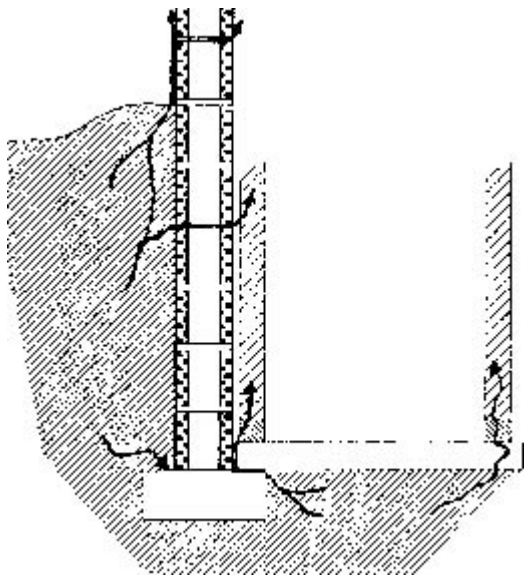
Basement construction with arrows indicating potential termite entry points (illustration courtesy of MSUE)
